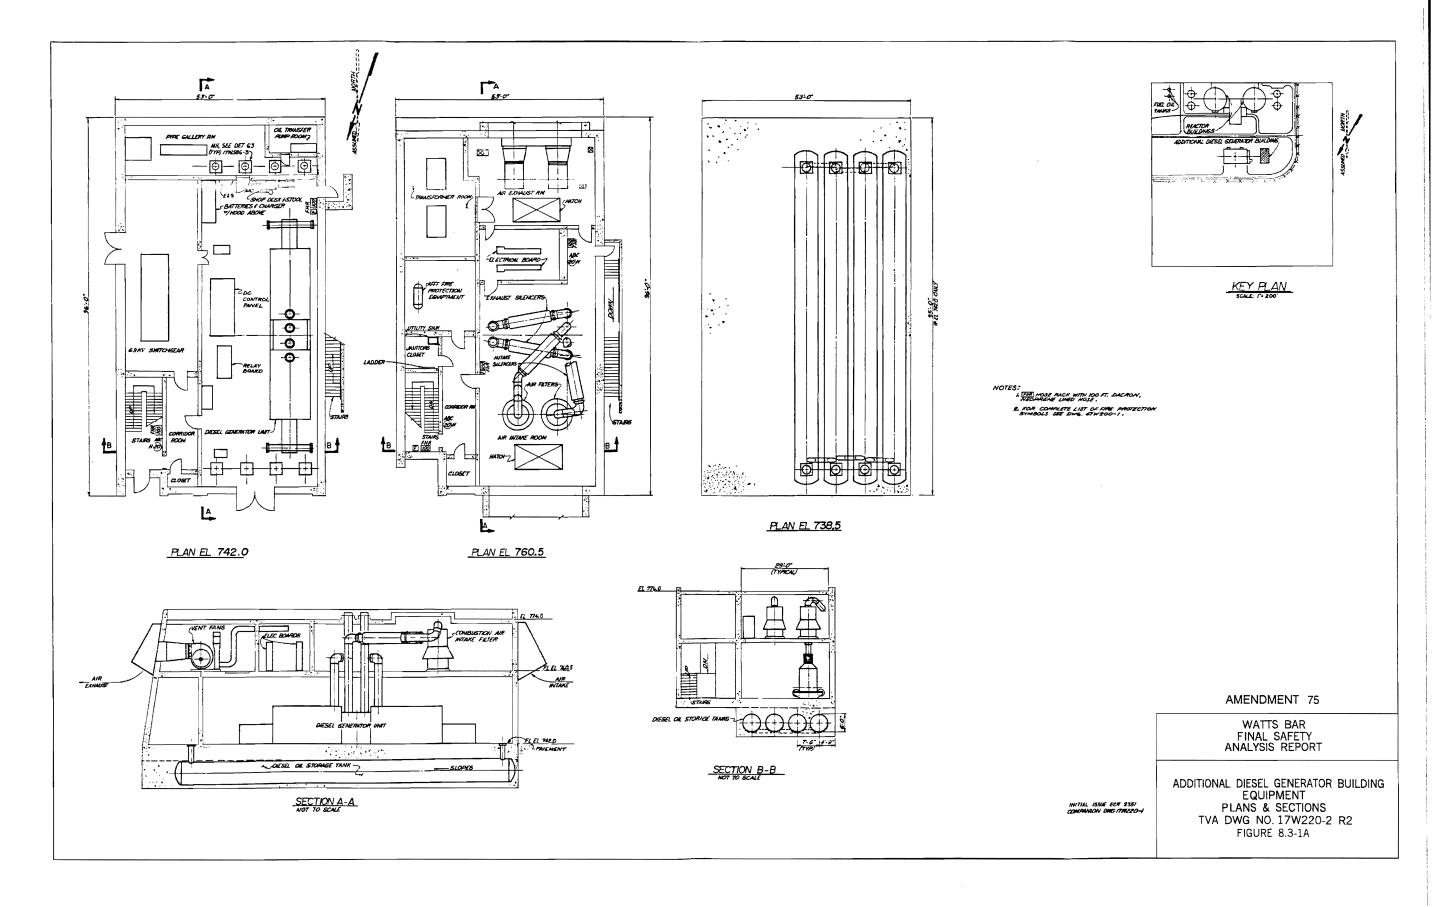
Additional Diesel Generator Building Equipment Plans and Sections
